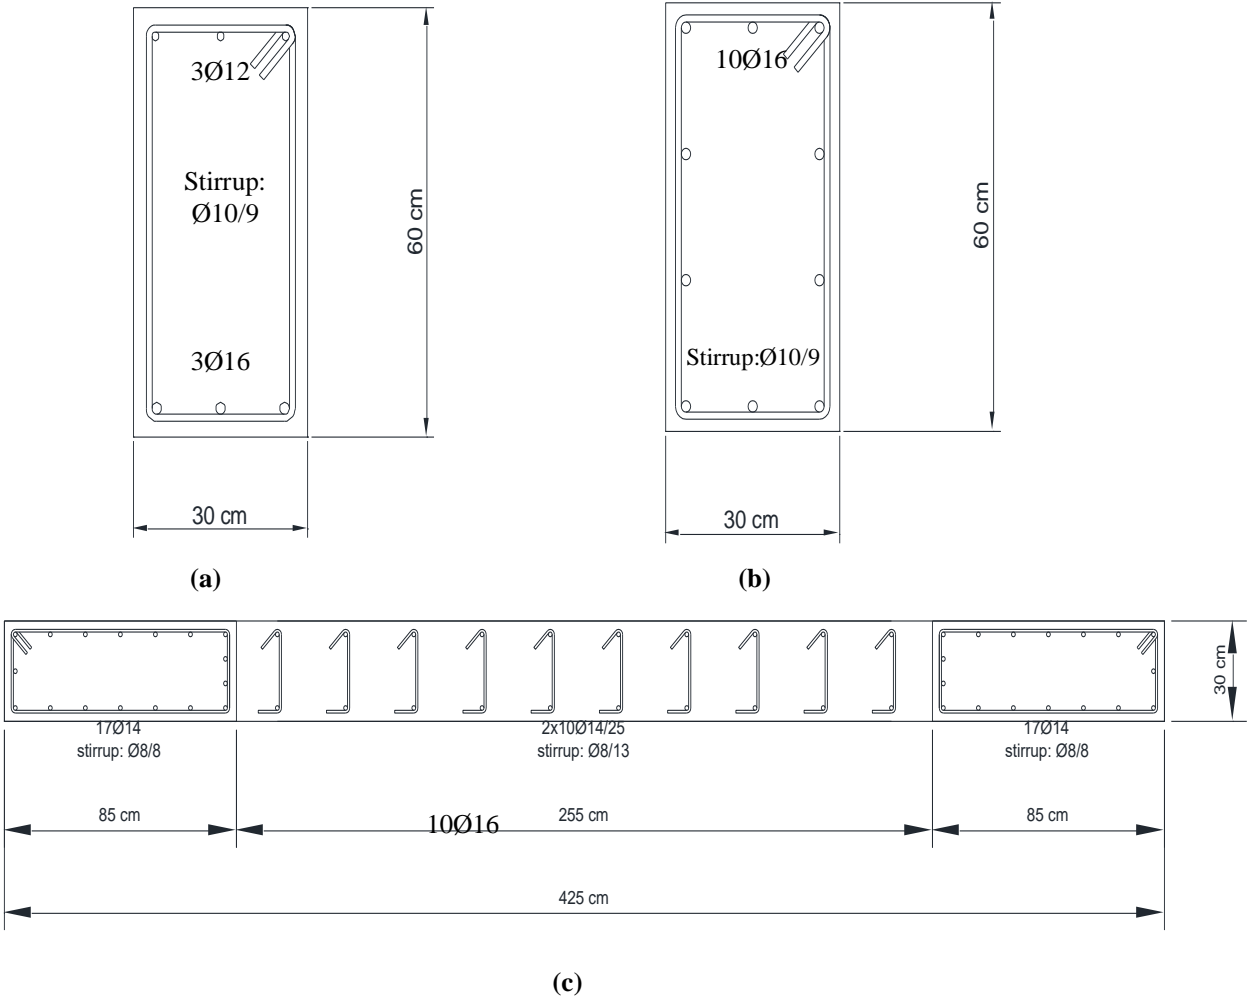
Cross section of (a) beams and (b) columns (c) shear walls
